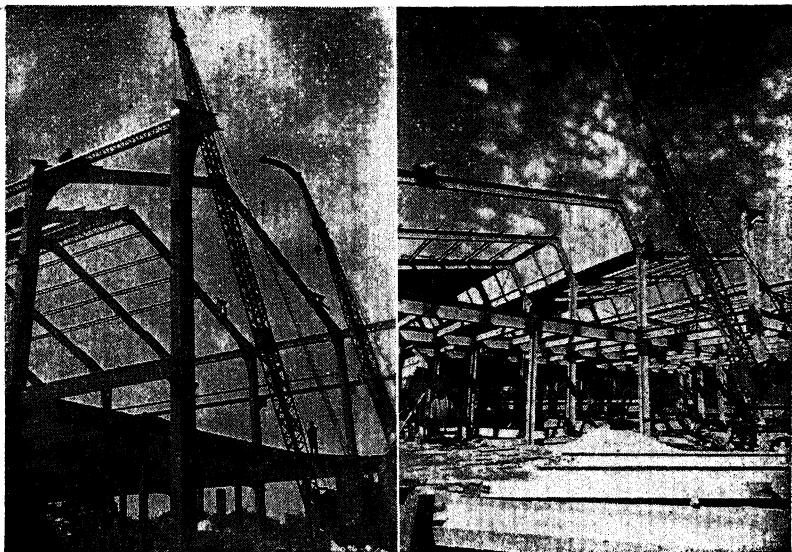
Left: Construction view showing the erection of a 65-ft. rafter beam. Right: Erecting the beam of one of the saw tooth sections.
